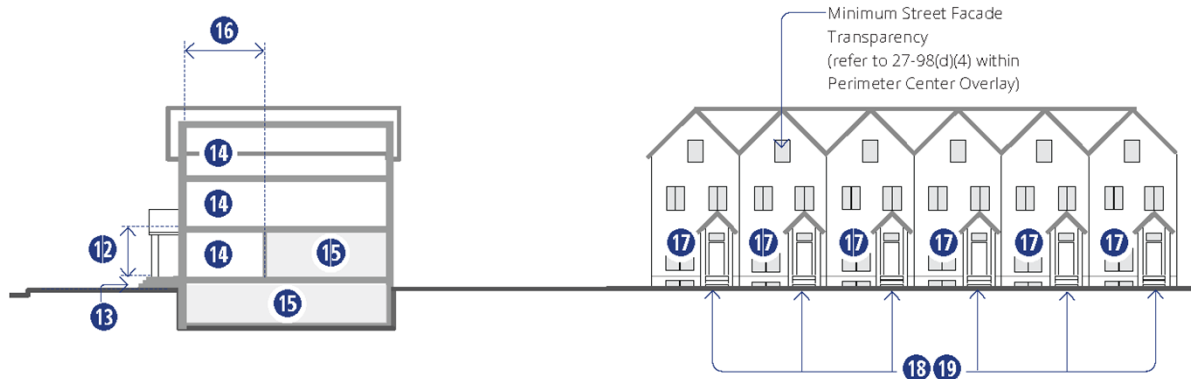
Townhouse Building: Floor-to-Floor Height & Use Requirements
